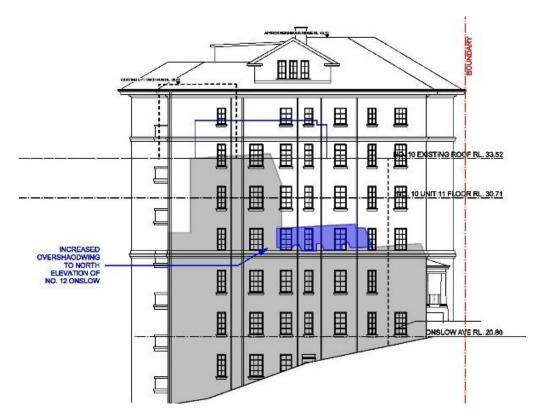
North elevation of Darnley Hall showing additional overshadowing at 1:00pm on 21 June
